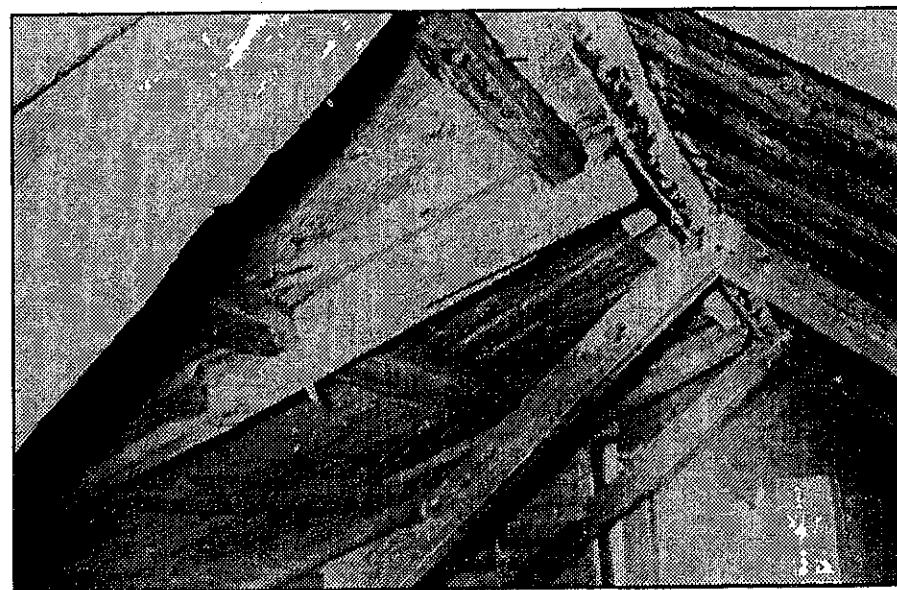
View in the attic showing building II roof rafters and extension at left.
